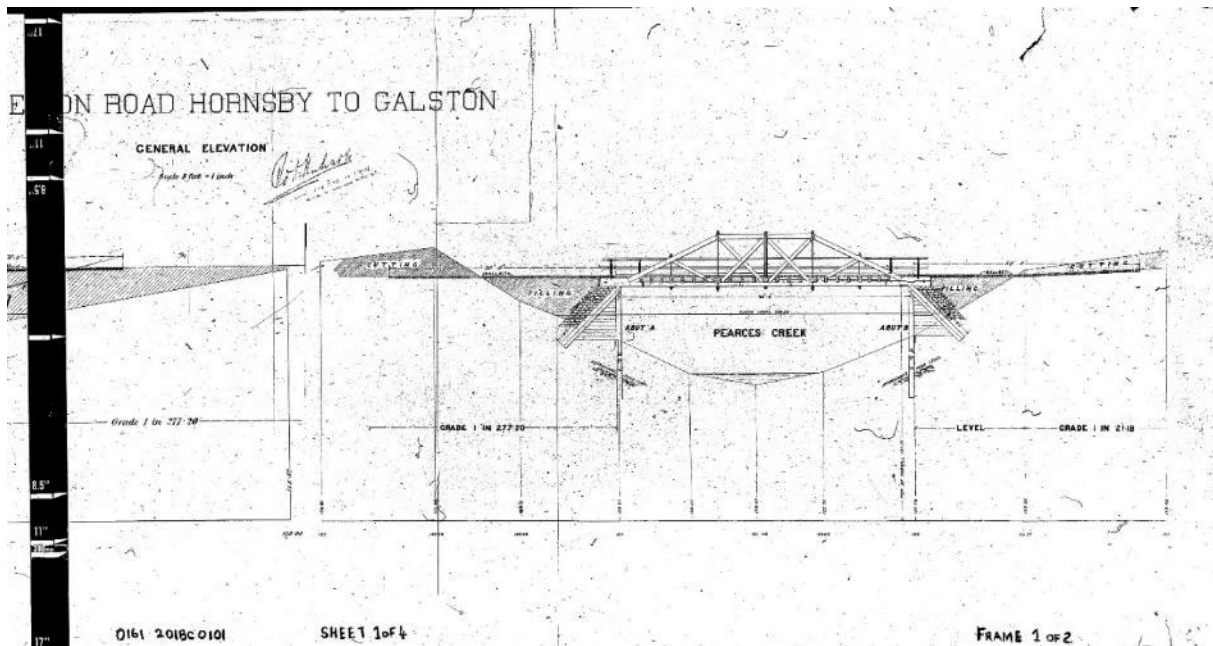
Elevation of the bridge over Pearce's (Tunks) Creek. (Source: Bridges on Road Hornsby to Galston, Department of Public Works, Roads and Bridges and Sewerage Brand, c.1892. RTA 161.201.BC.0101)
